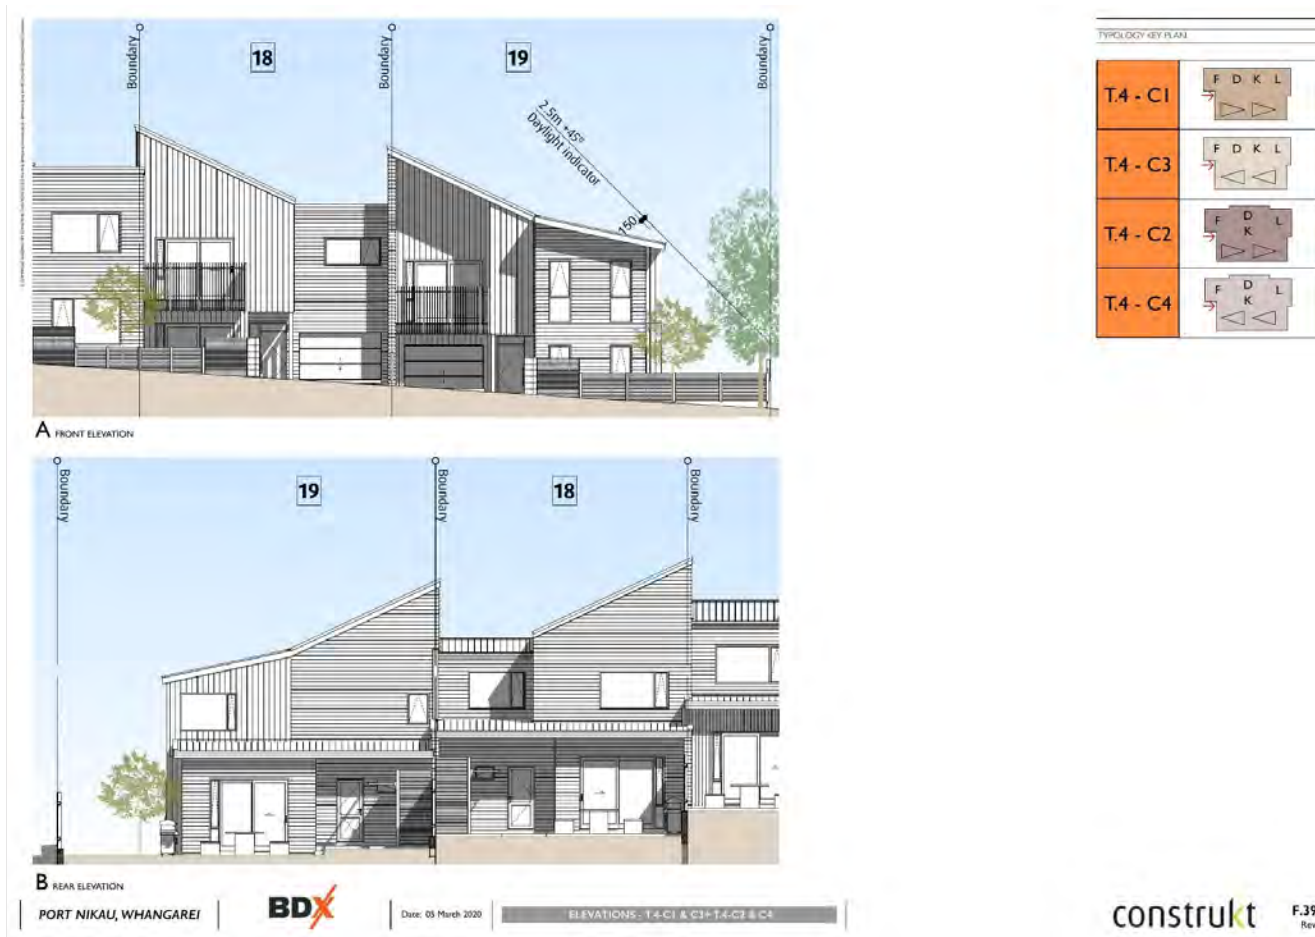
PDNA 1. Part F – Typology Plans and Elevations
